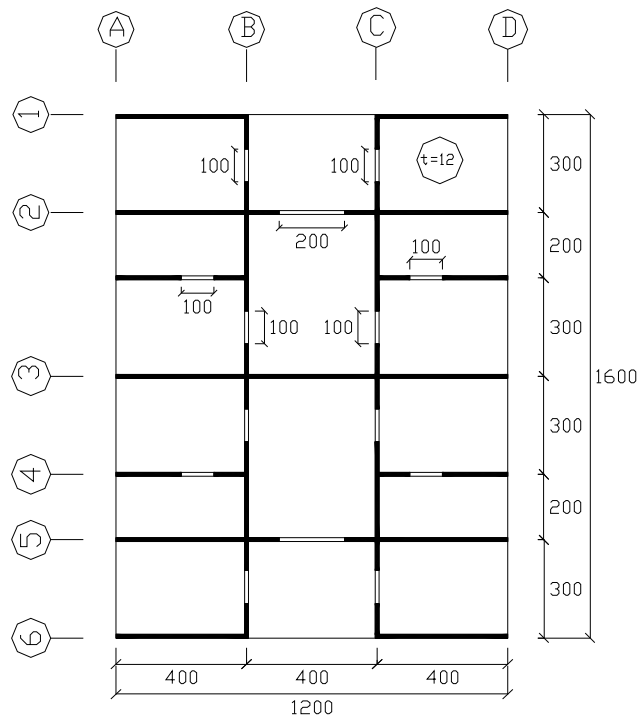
Typical plan view – Plan No. 18 (units in cm)
